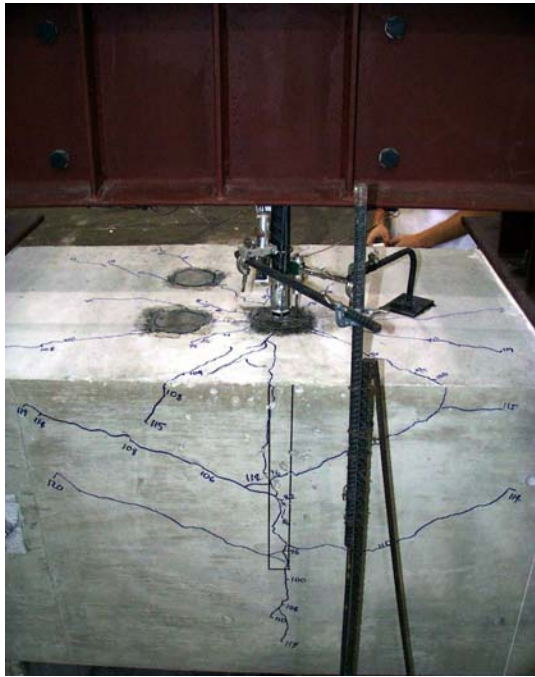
Cracking Pattern at Failure in Test No. 10
